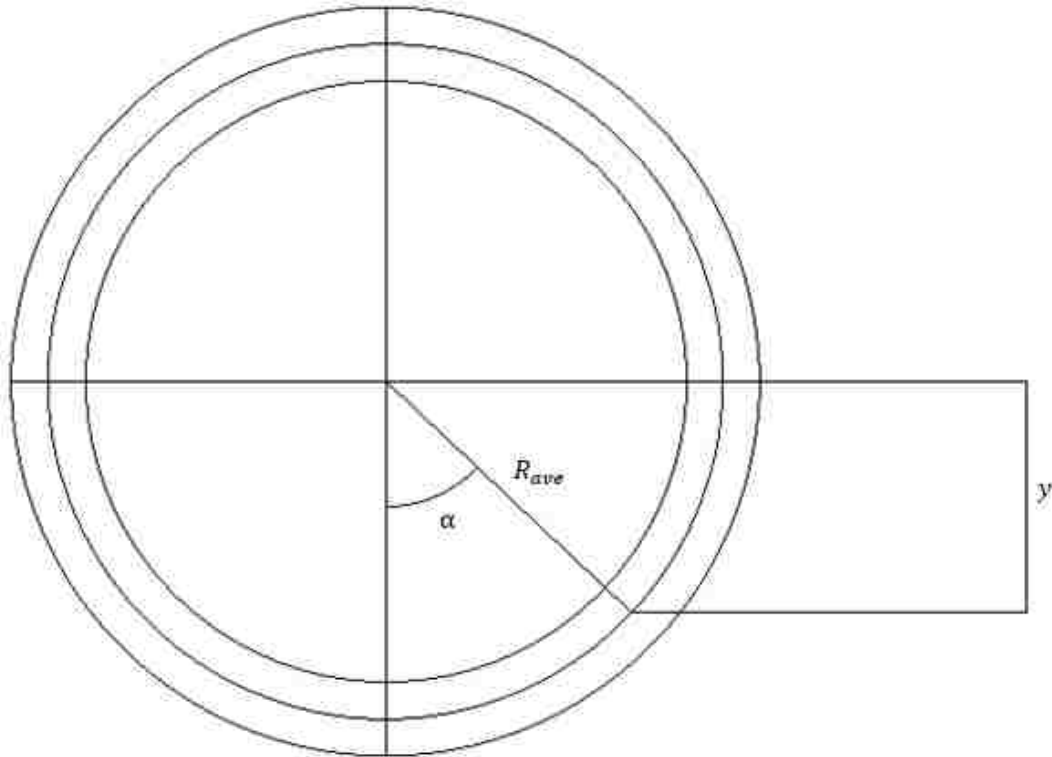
Cross-section of test specimen used for transverse load capacity calculations
